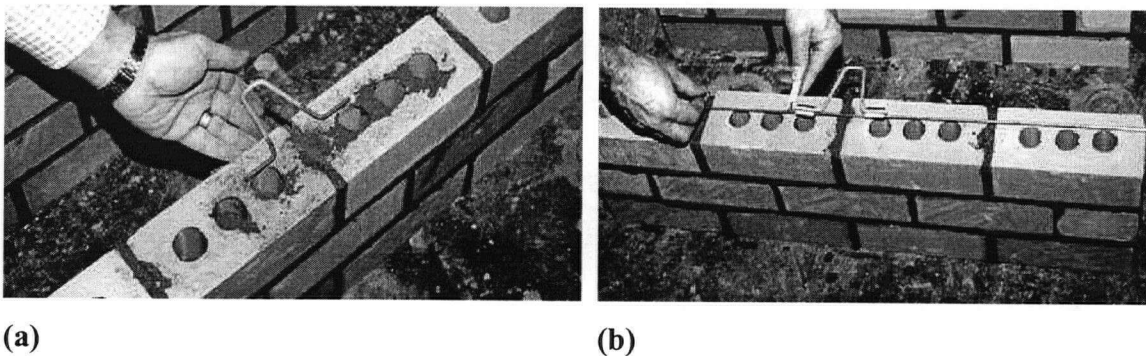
Off centre tie location for the construction tolerance specimens: (a) tie only, (b) tie with clipped wire joint reinforcement.
